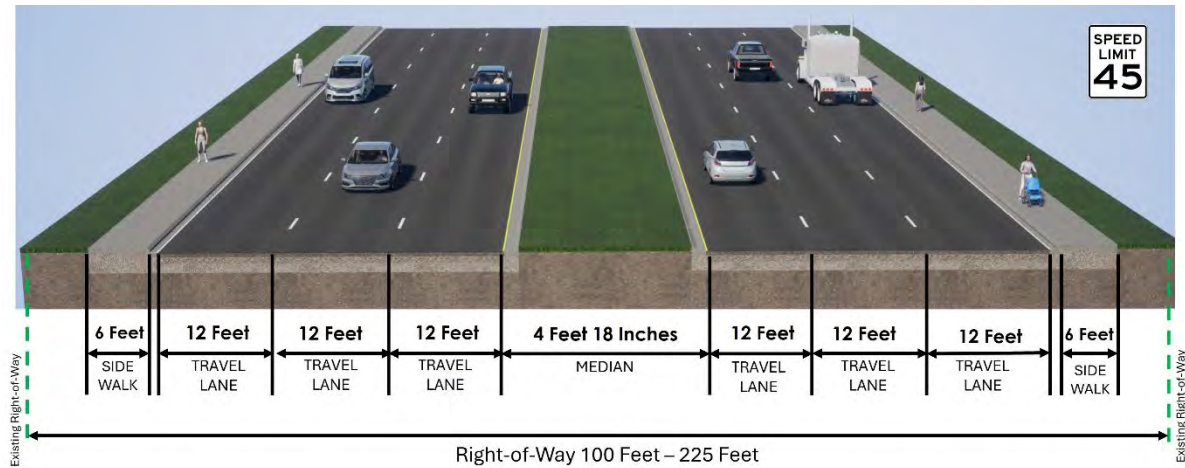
Existing Roadway Typical Section: South of DeSoto Bridge
